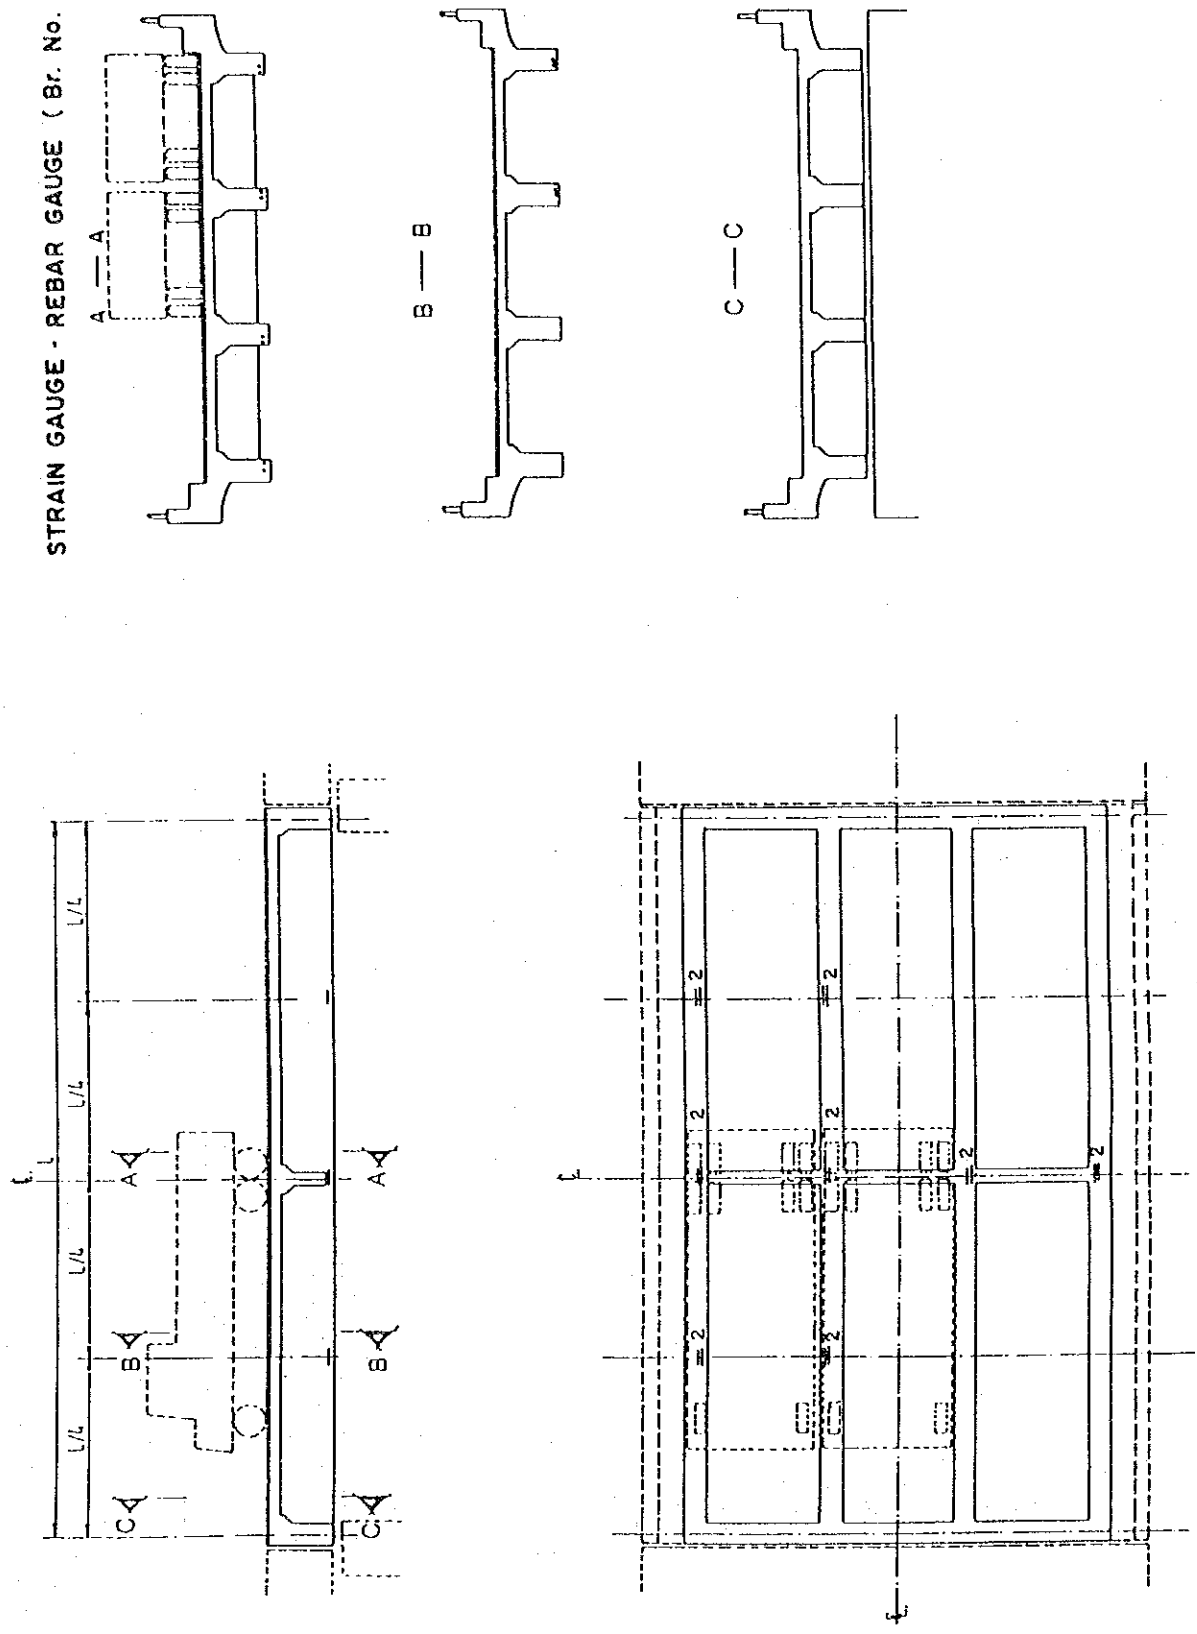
Setting Position of Measurement Equipment (Br.No.3)
